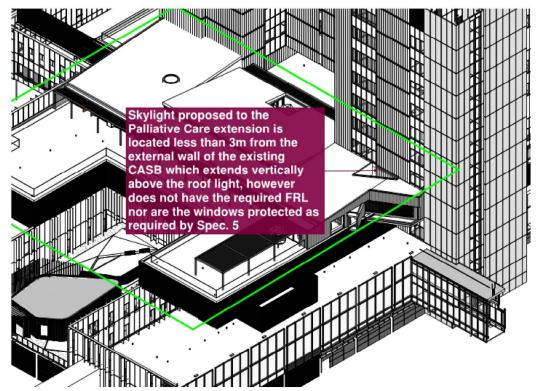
Axo view from the South detailing the location of the rooflight from the external walls of the CASB
